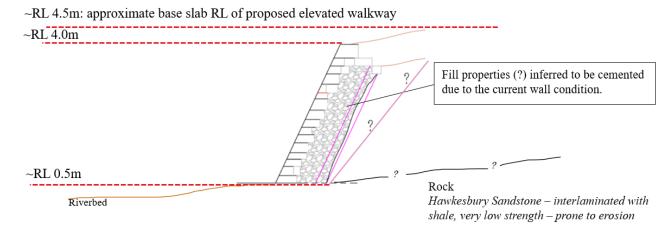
Indicative Section of the Parramatta Riverbed and Riverbank Wall
